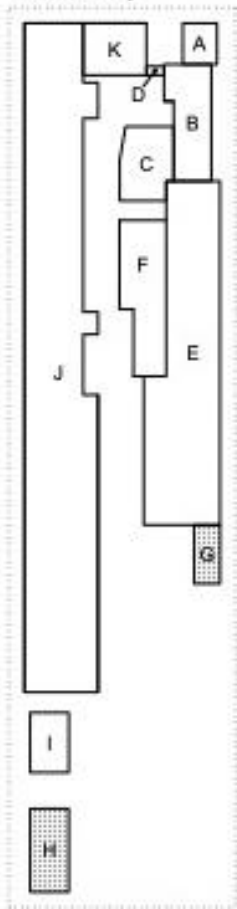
Floor Plans, Flask Repair Building, Forge Shop
